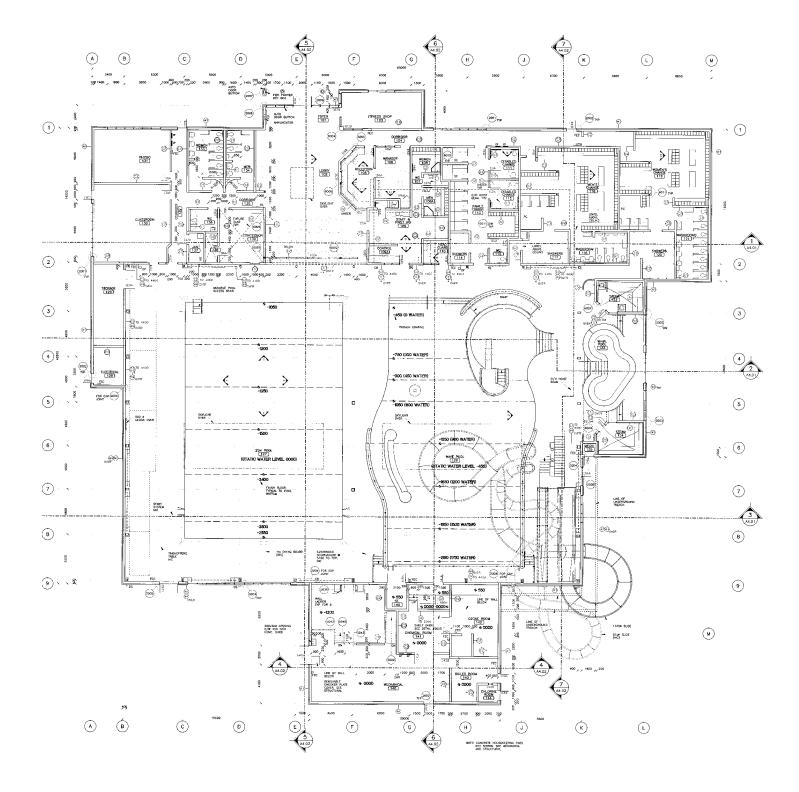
Overall Facility Floor Plan - Original Construction Drawings 1998
